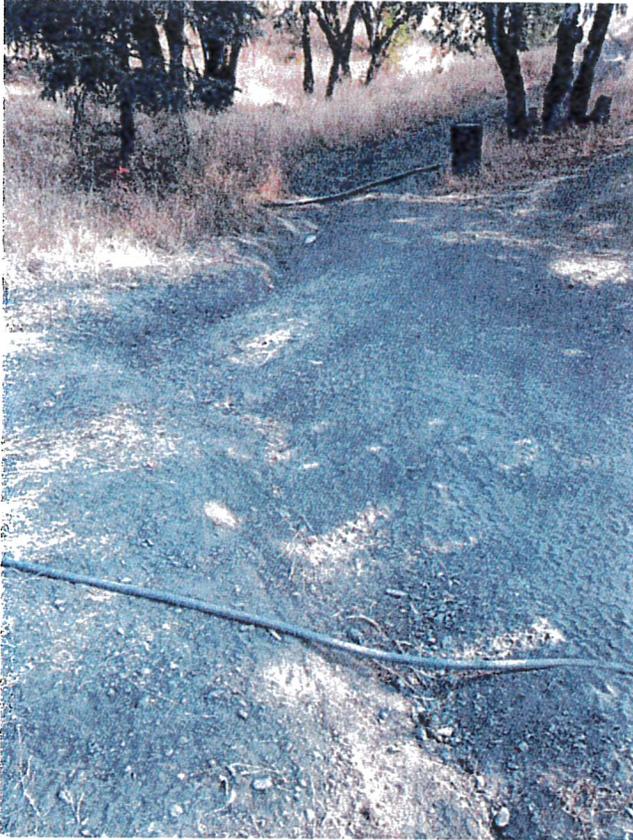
Road 2 where it receives surface road drainage from Road 3; also, where a rolling dip will be installed to divert any residual run-off eastward after the upslope Road 3 is decommissioned (see photo 4).
